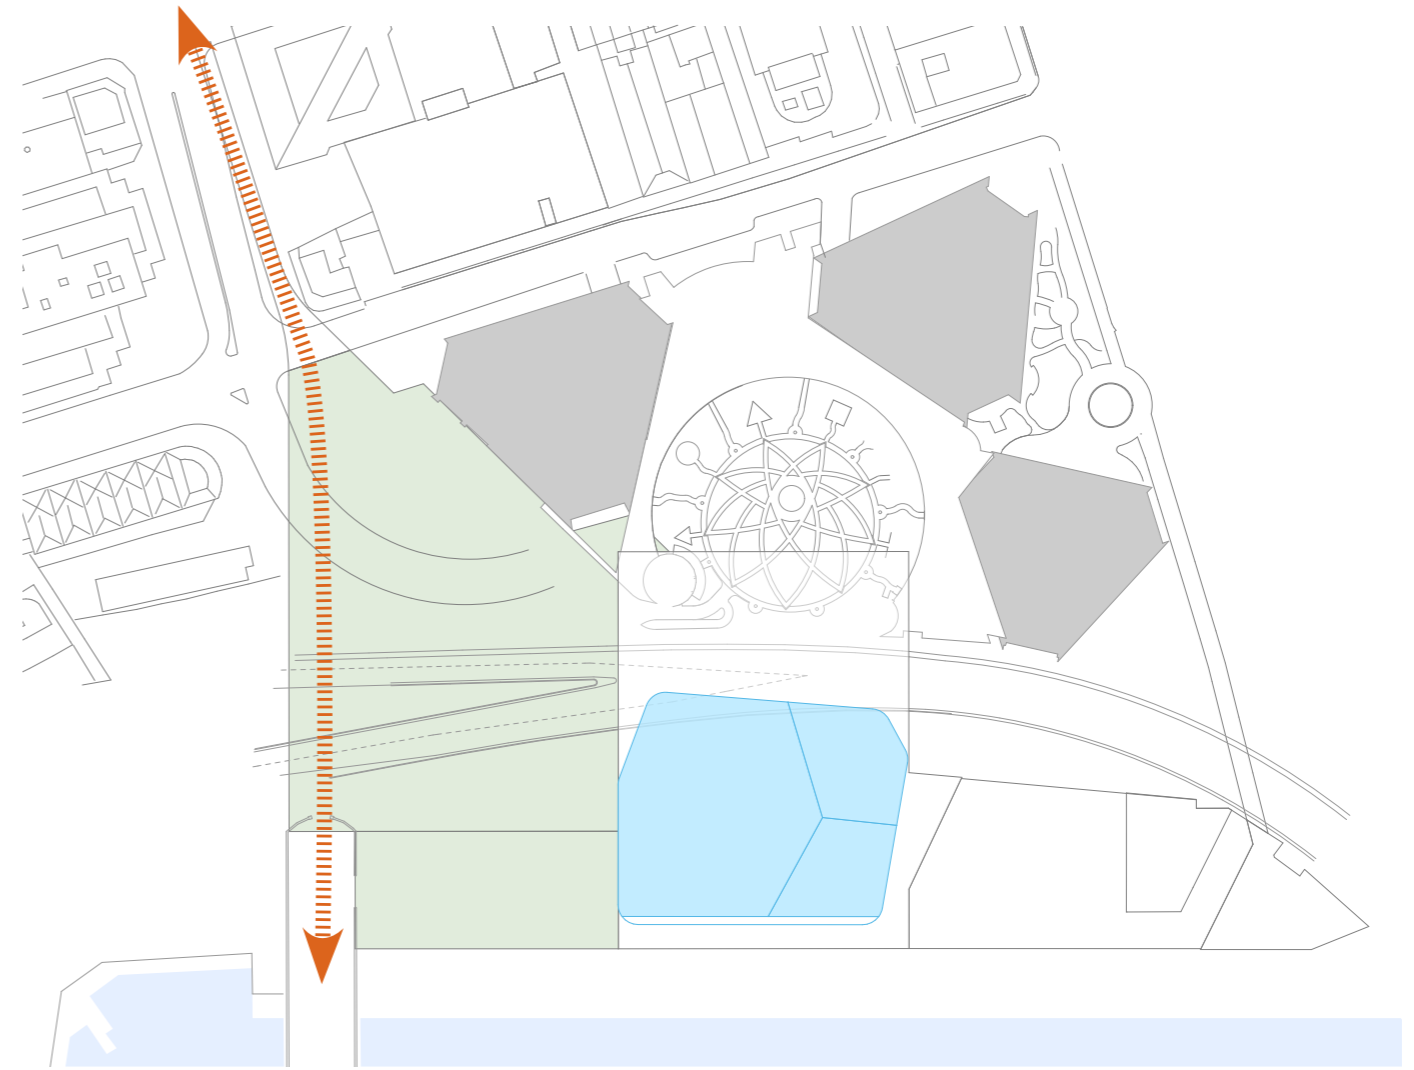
Digram showing indicative reconnection between Market Street and Pymont Bridge
